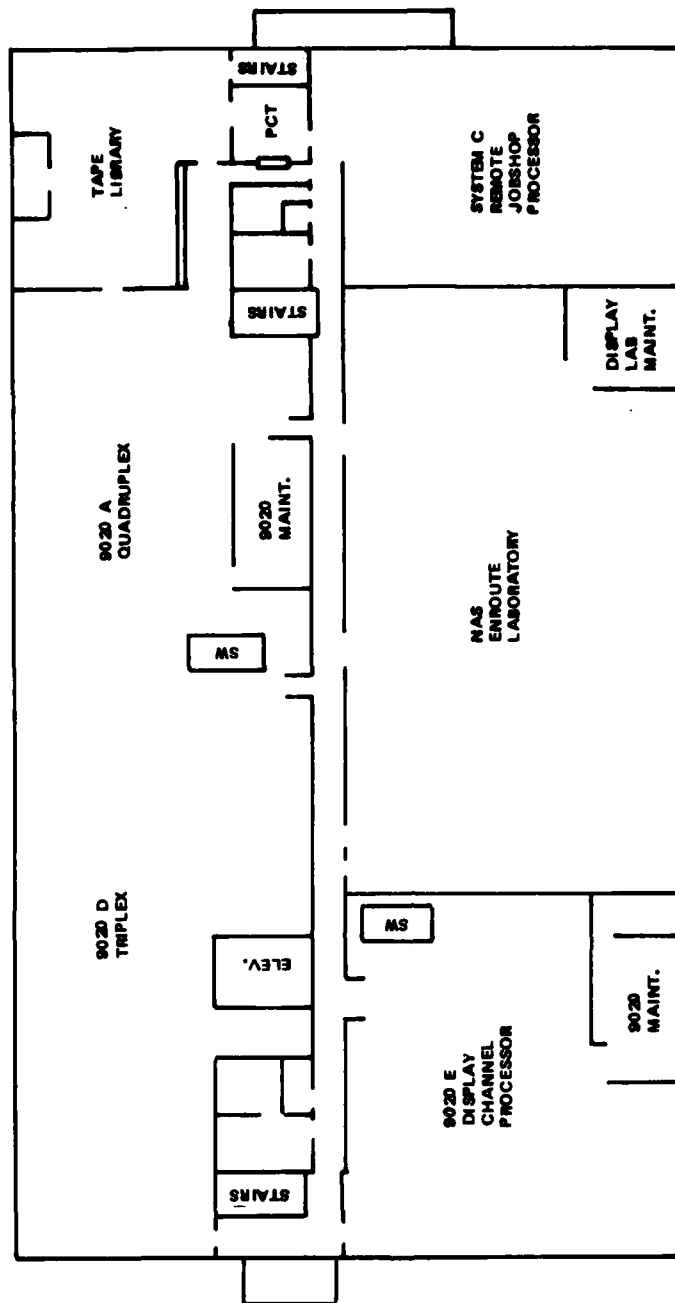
NAFEC BUILDING #149: SECOND FLOOR EQUIPMENT LOCATIONS
